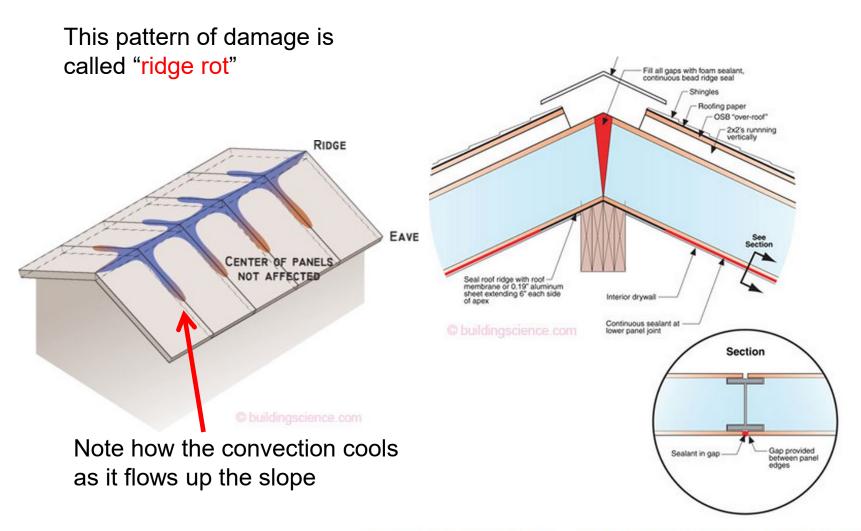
Avoiding SIP Roof Problems—Make the panel joints airtight especially over structural supports such as beams and purlins and provide a mechanism for moisture removal such as a vented over-roof.
